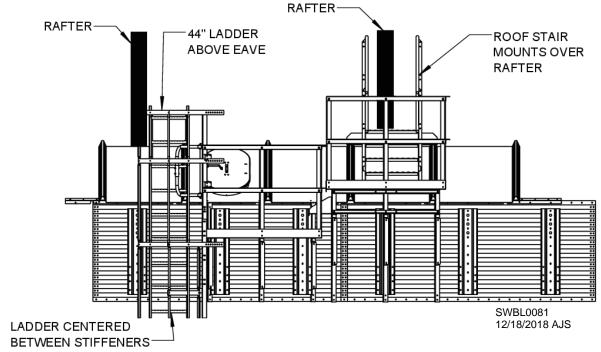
Ladder & platform locations with 3 stiffeners & 3 roof sheets per sidewall sheet
